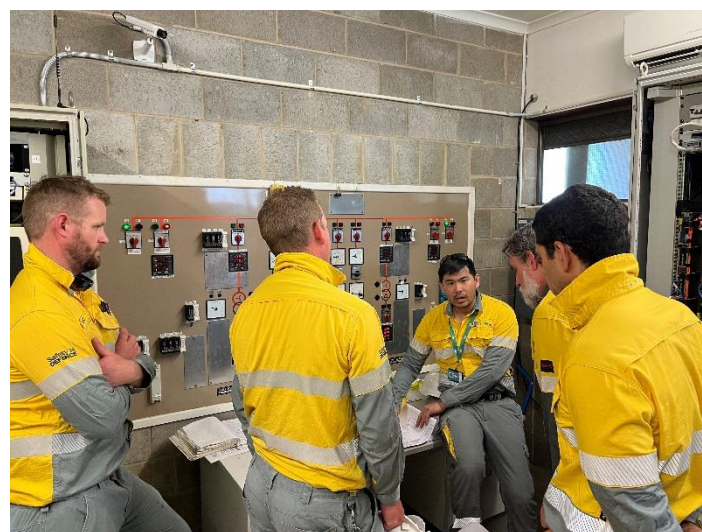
Ergon staff visited the Cannonvale substation recently to discuss and plan the electrical upgrade.
